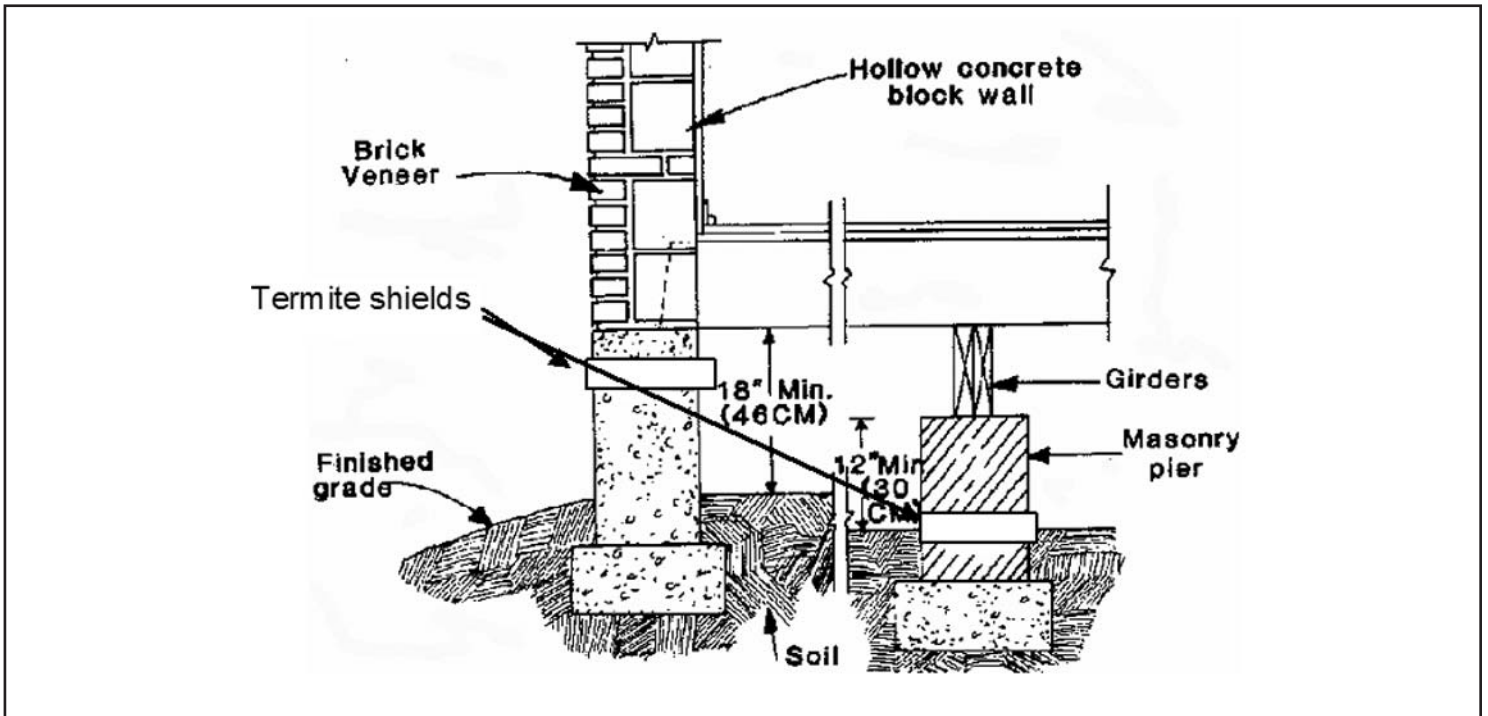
Construction Techniques That Discourage Termite Attacks: Thin Metal Termite Shield Should Extend 2 Inches Beyond Foundation and 2 Inches Down [2]
